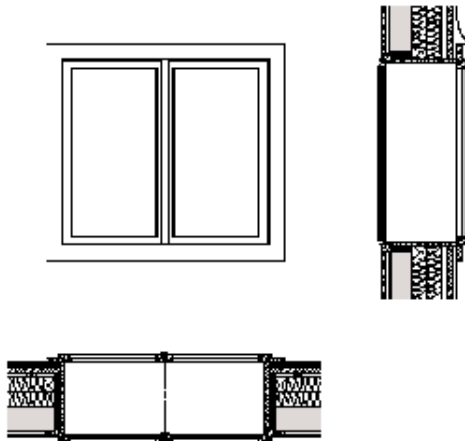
AlpHouse pilot-building R. in Andelsbuch, window details after renovation, by Arch. G. Gruber for EIV
